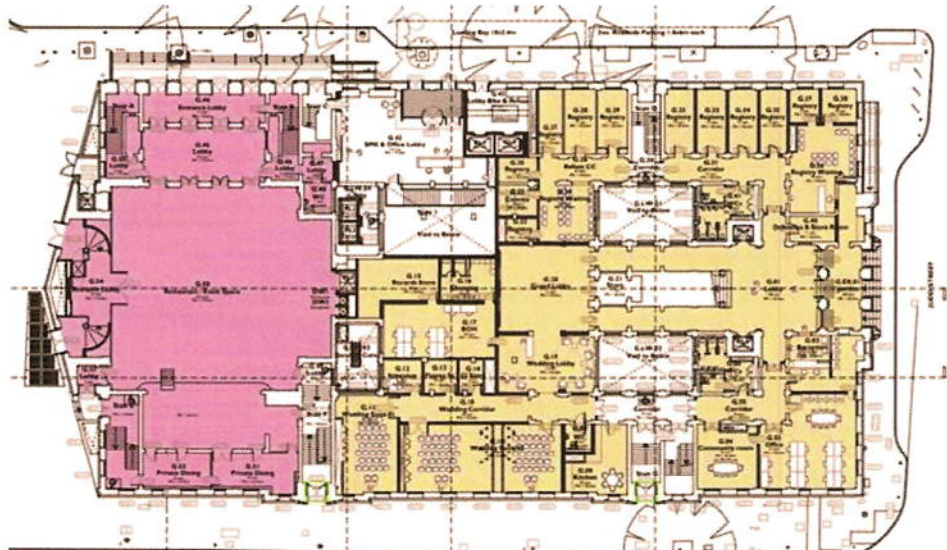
Proposed Ground Floor Plan (Ref: 2019/2238/P)
